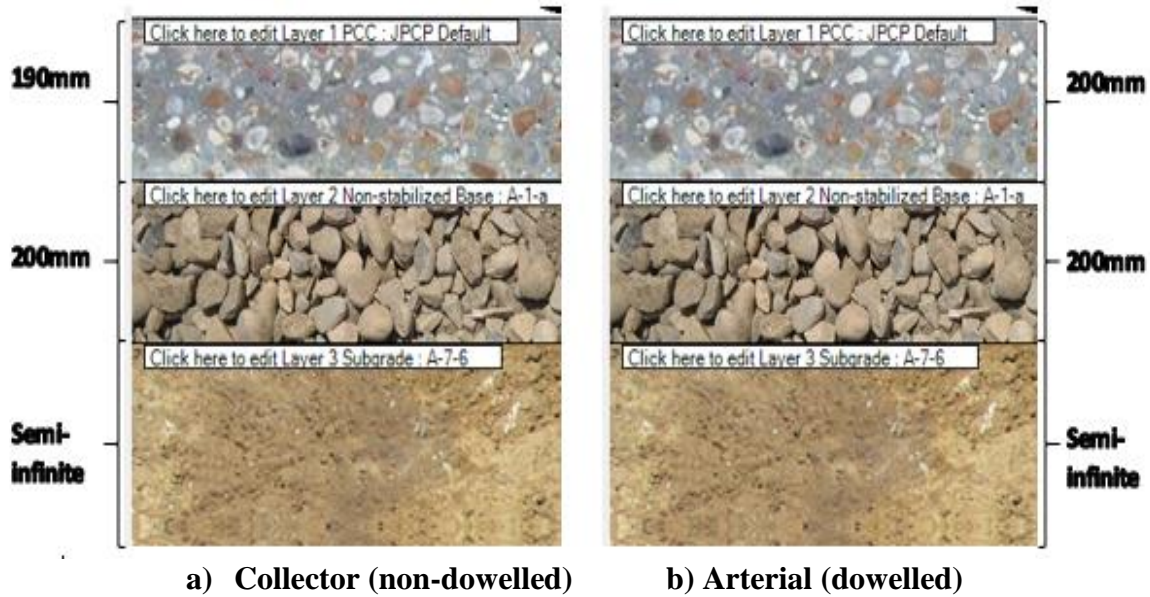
Pavement Structure for a Collector and Arterial Typical Ontario Pavement
